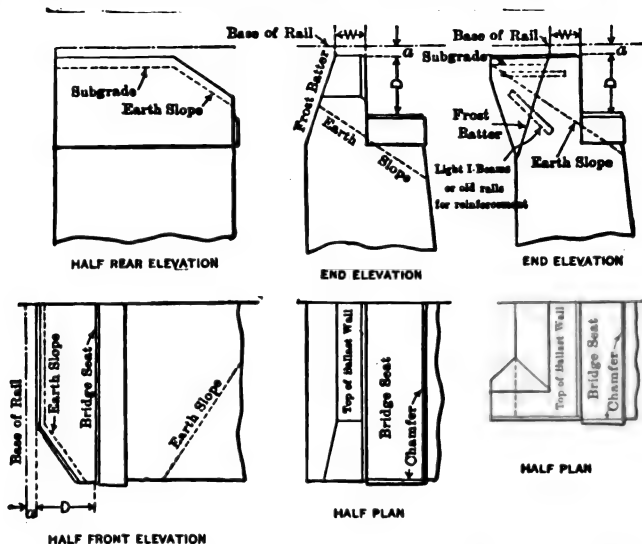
CONCRETE ABUTMENTS. LUTHER. FIG. 231.—CONCRETE ABUTMENTS. LUTHER.
